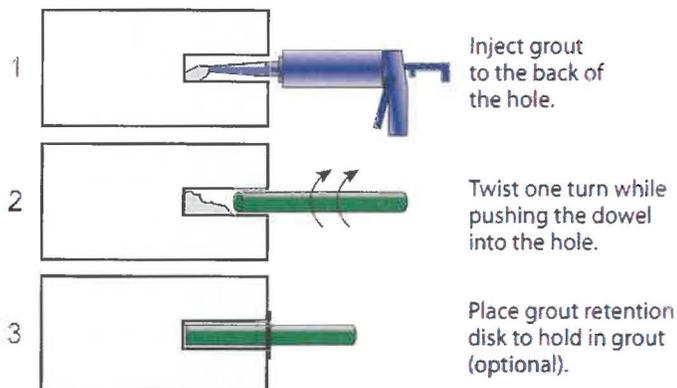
Steps for installing dowels in drilled holes in an existing concrete pavement.
